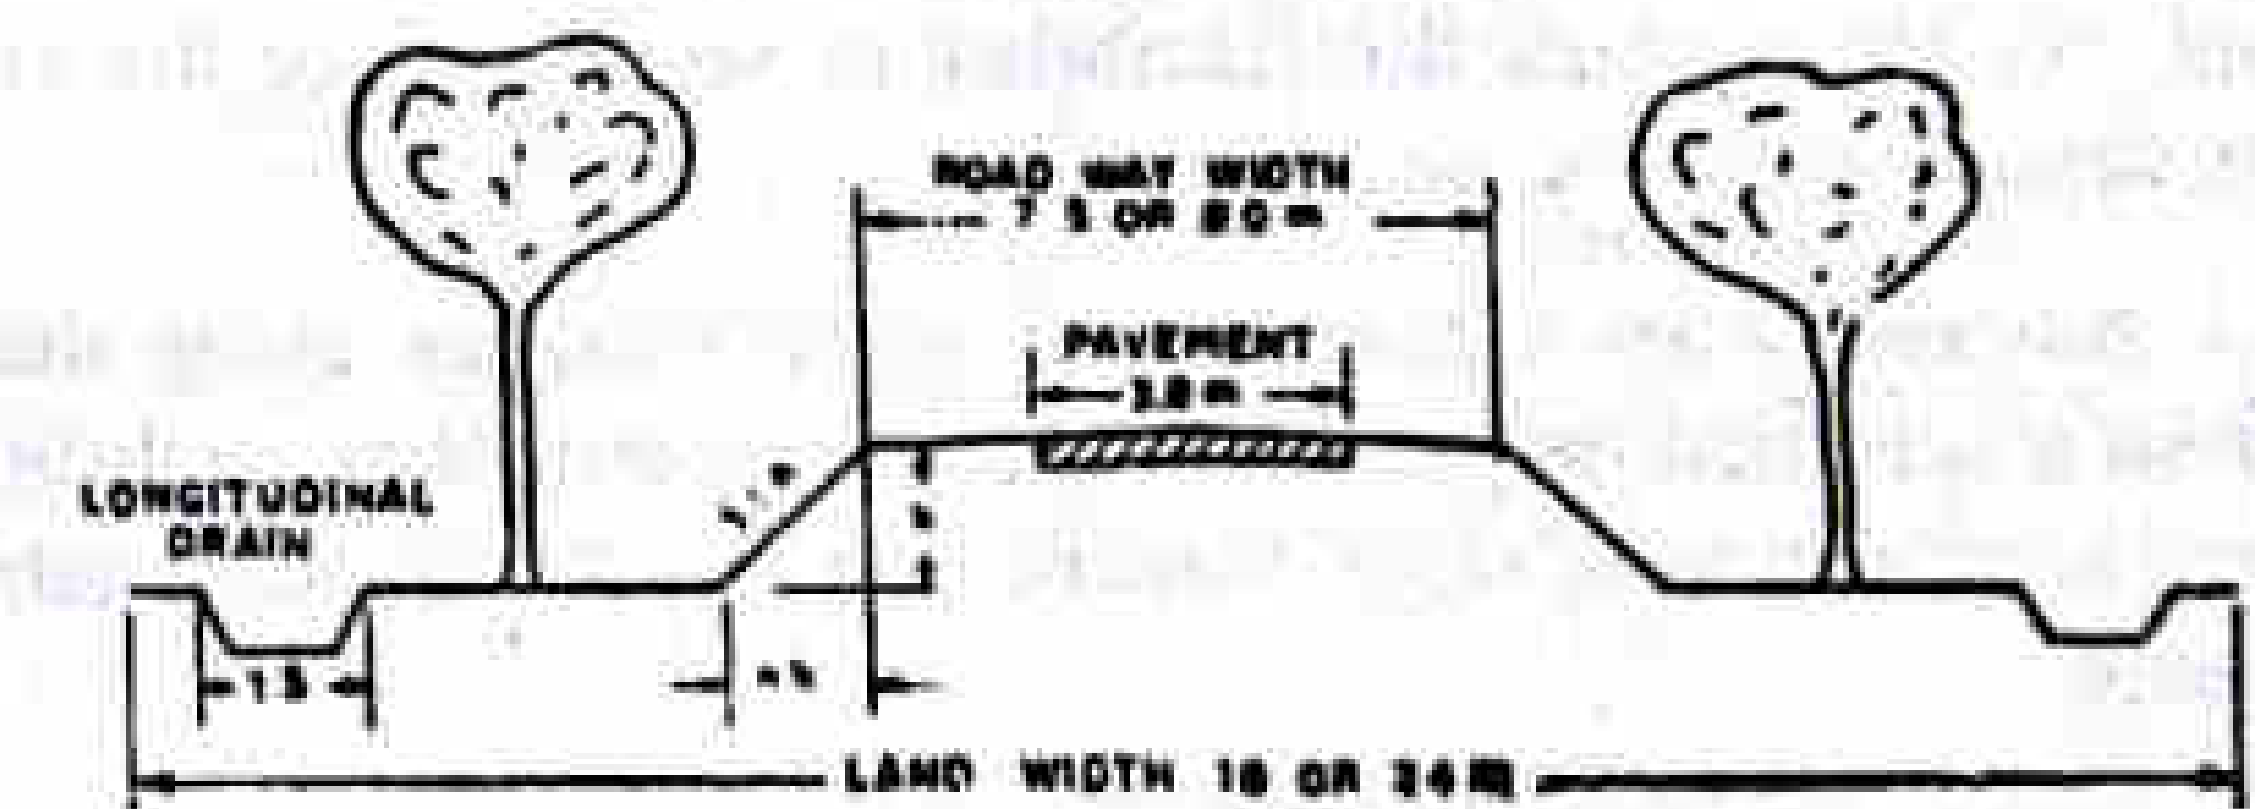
Cross Section of VR or ODR in Embankment in Rural Area
